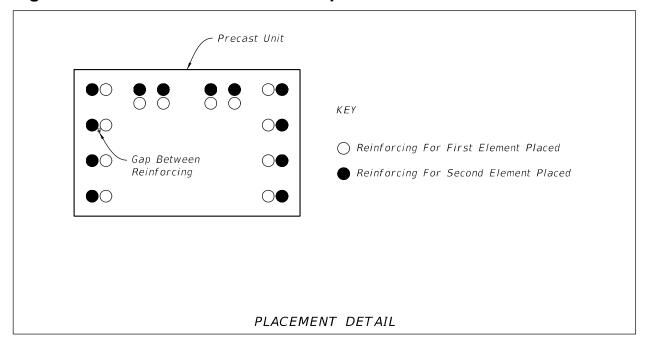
Precast Element Lap Bar Orientation
